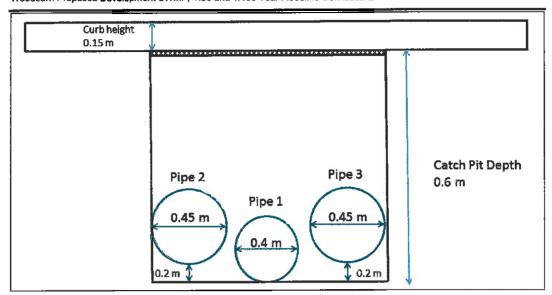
Conceptual Cross Section Schematic of the Catch Pit and the Stormwater diversion Pipes.
